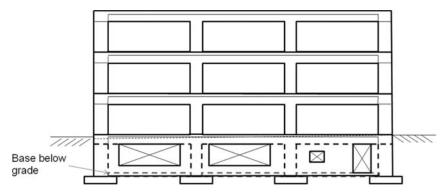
Base below Substantial Openings in Basement Wall.
